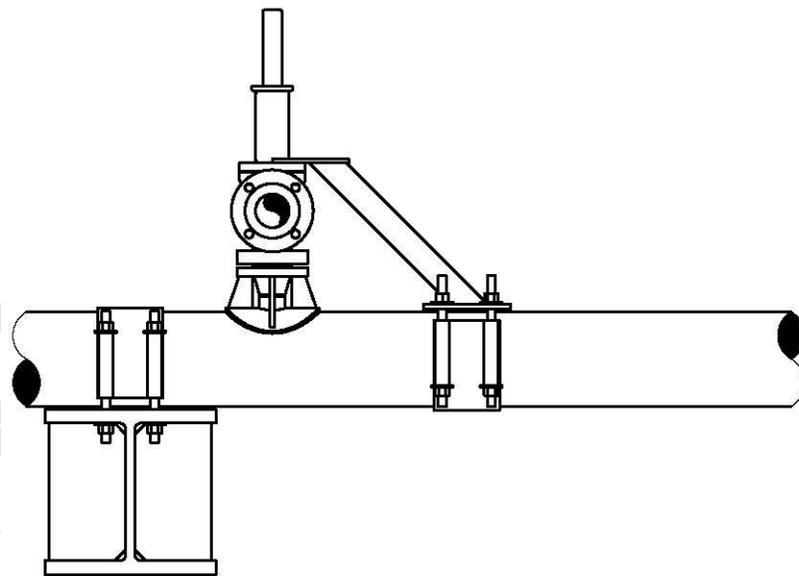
Example of Clamped Pipe Support and Welded Flange Gussets With Repad
